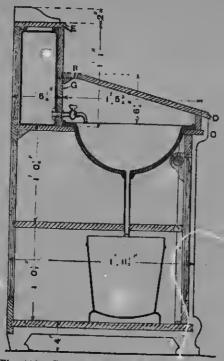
6.—Cross Section of Bedroom Lavatory with Reservoir.
